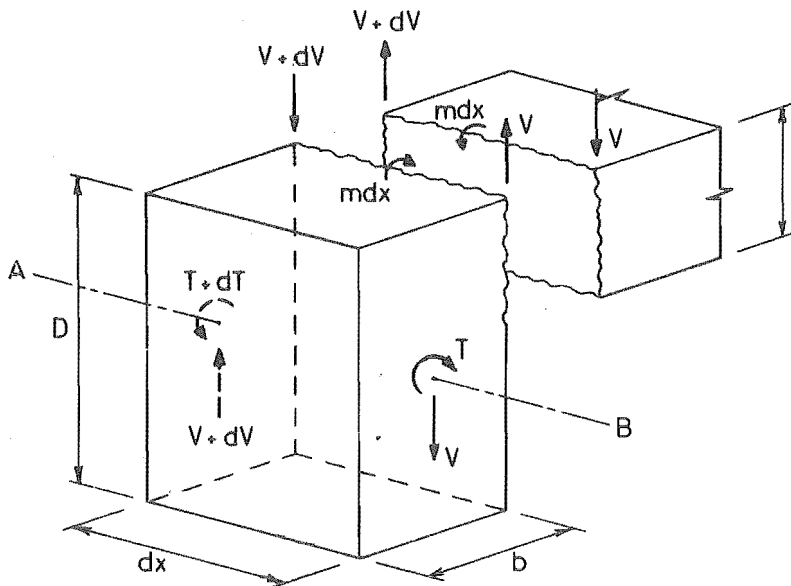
ELEMENTAL STRIP OF LATERAL BEAM AND SLAB
